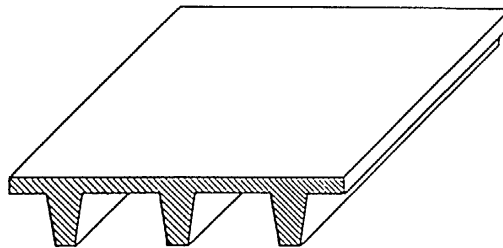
Concrete slab reinforced by a set of equidistant ribs.
